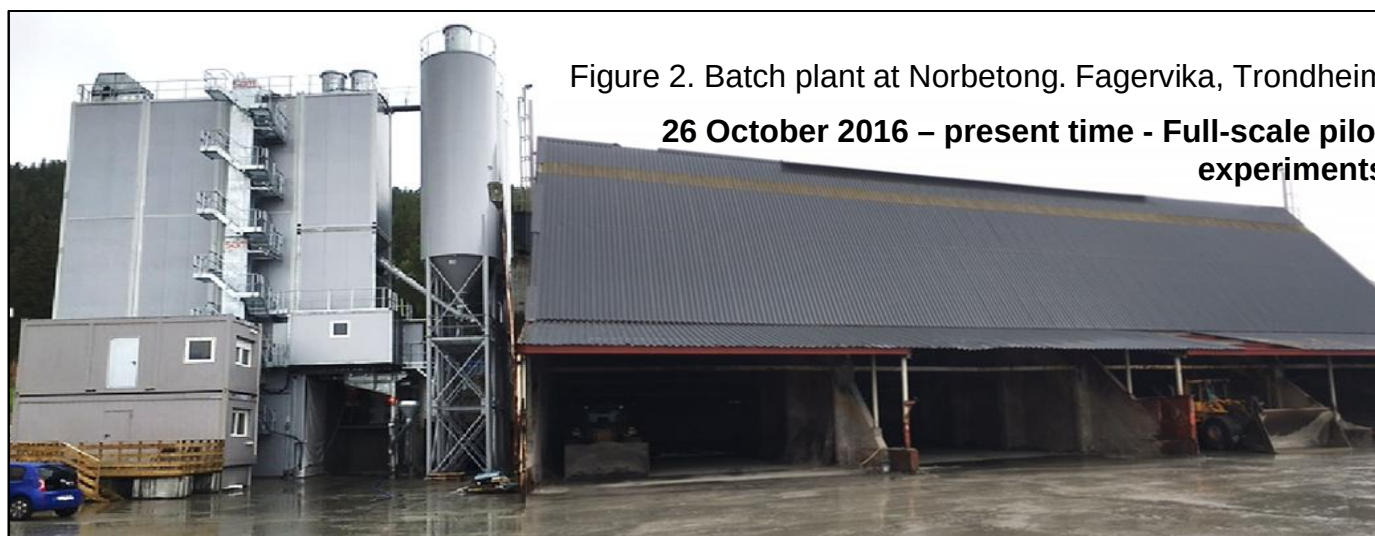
Batch plant at Norbetong. Fagervika, Trondheim
